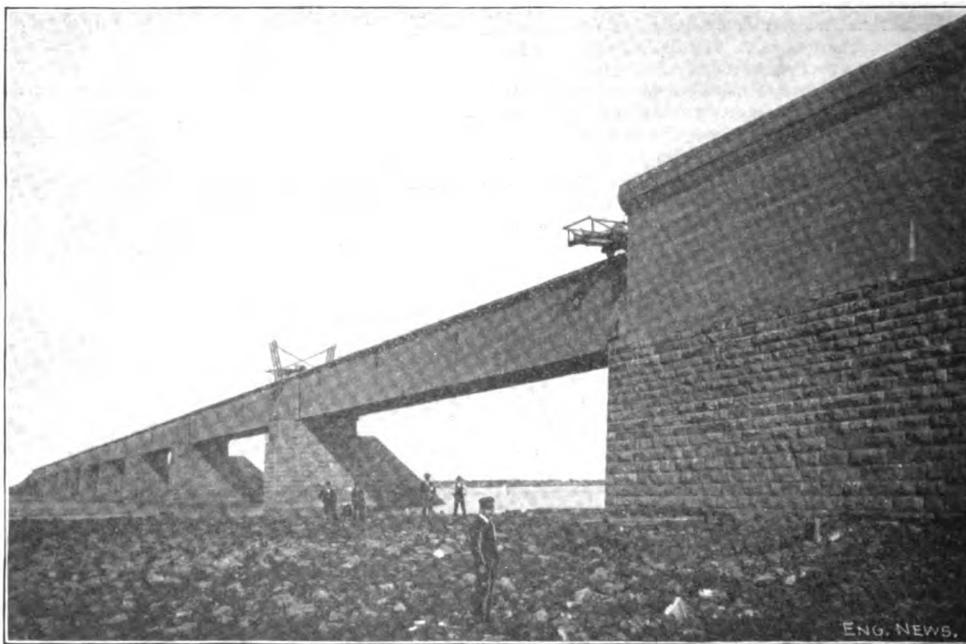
VIEW OF ABUTMENT AND END SPANS OF THE VICTORIA TUBULAR BRIDGE.
